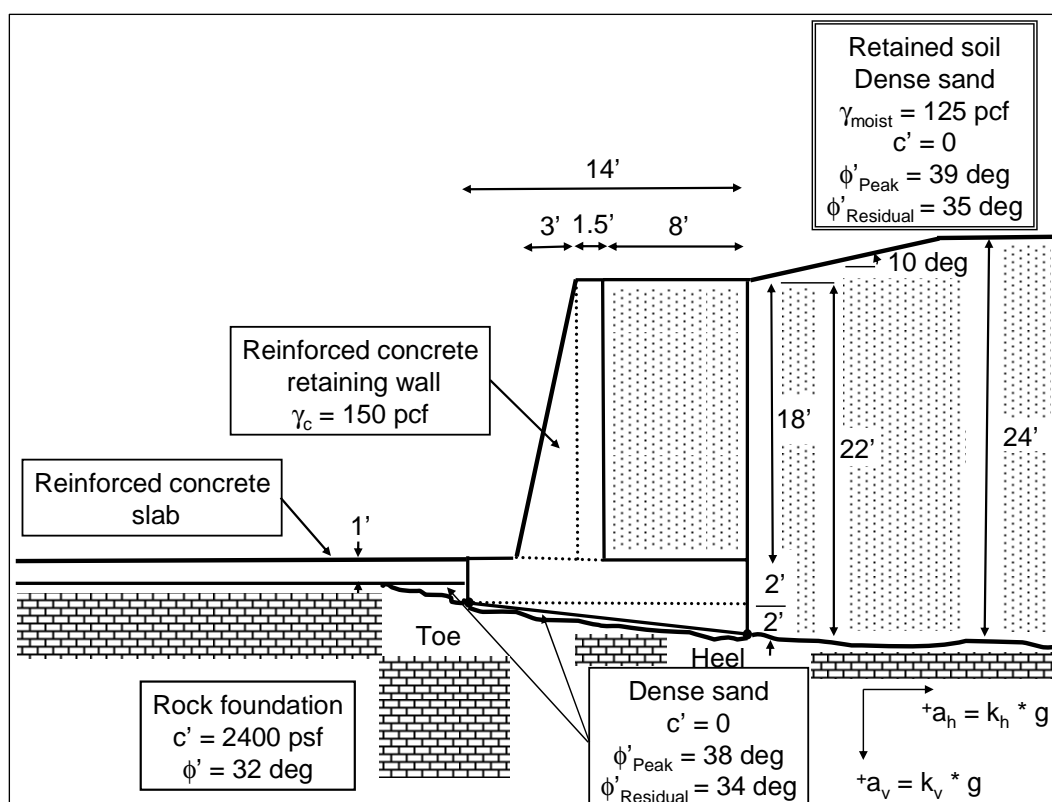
Rock-founded earth retaining wall buttressed at the toe of the wall by a 1-ft thick reinforced concrete slab for Example 2.
